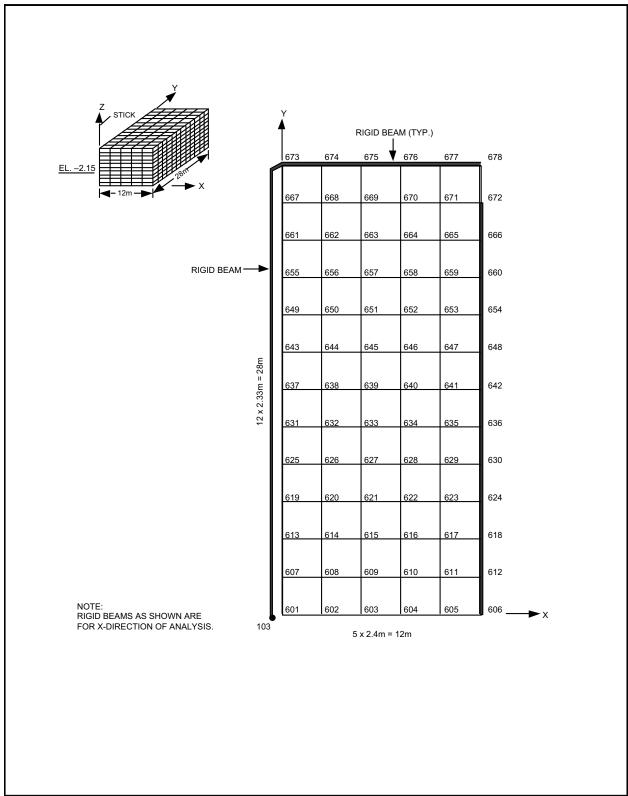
A-37 UB Case: Nodal Points at Elevation –2.15m
